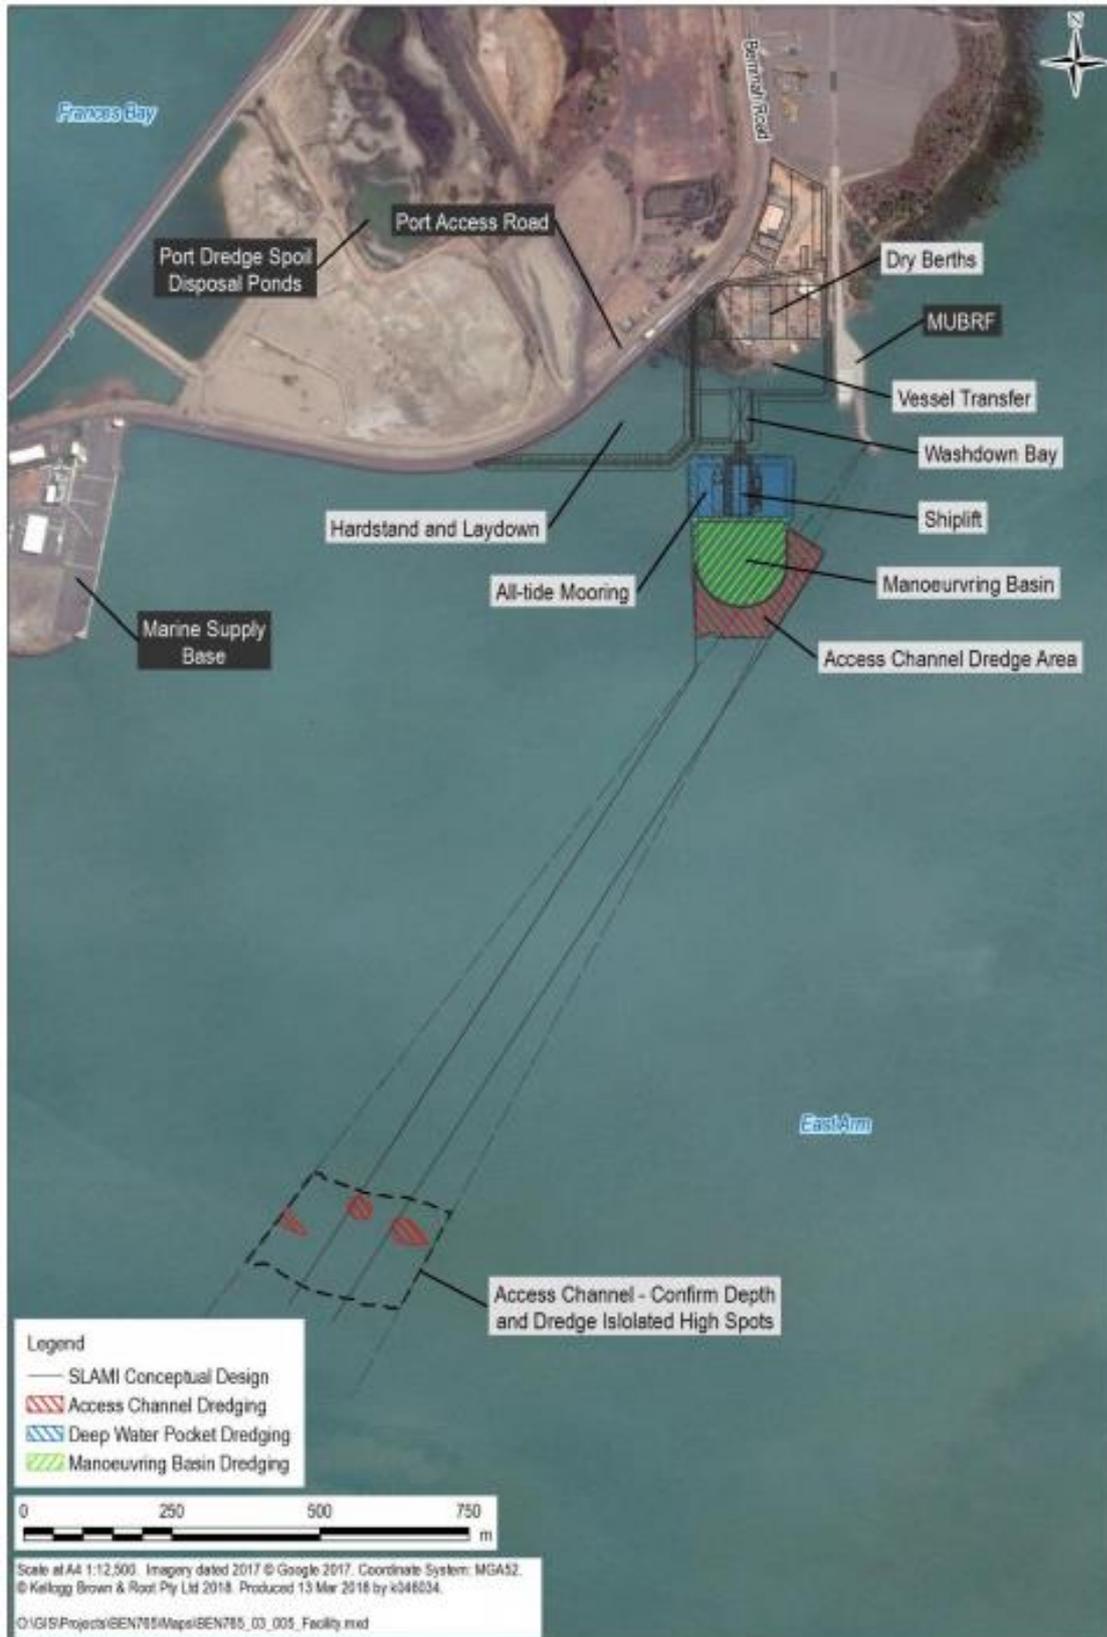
Proposed Project Site and Dredging Areas (Source NOI)
